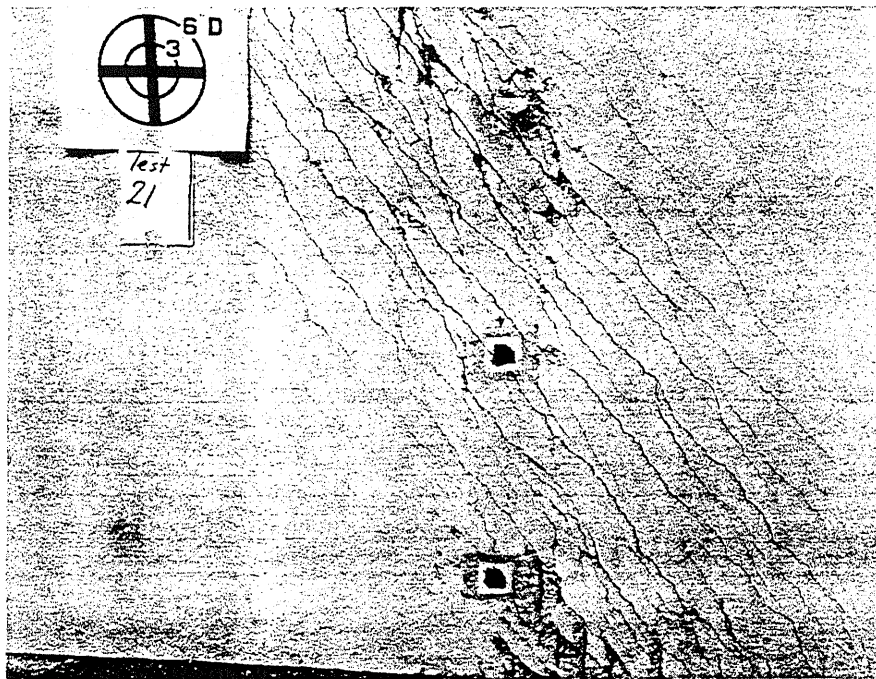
CRACK PATTERN IN BOTTOM SURFACE OF B21
